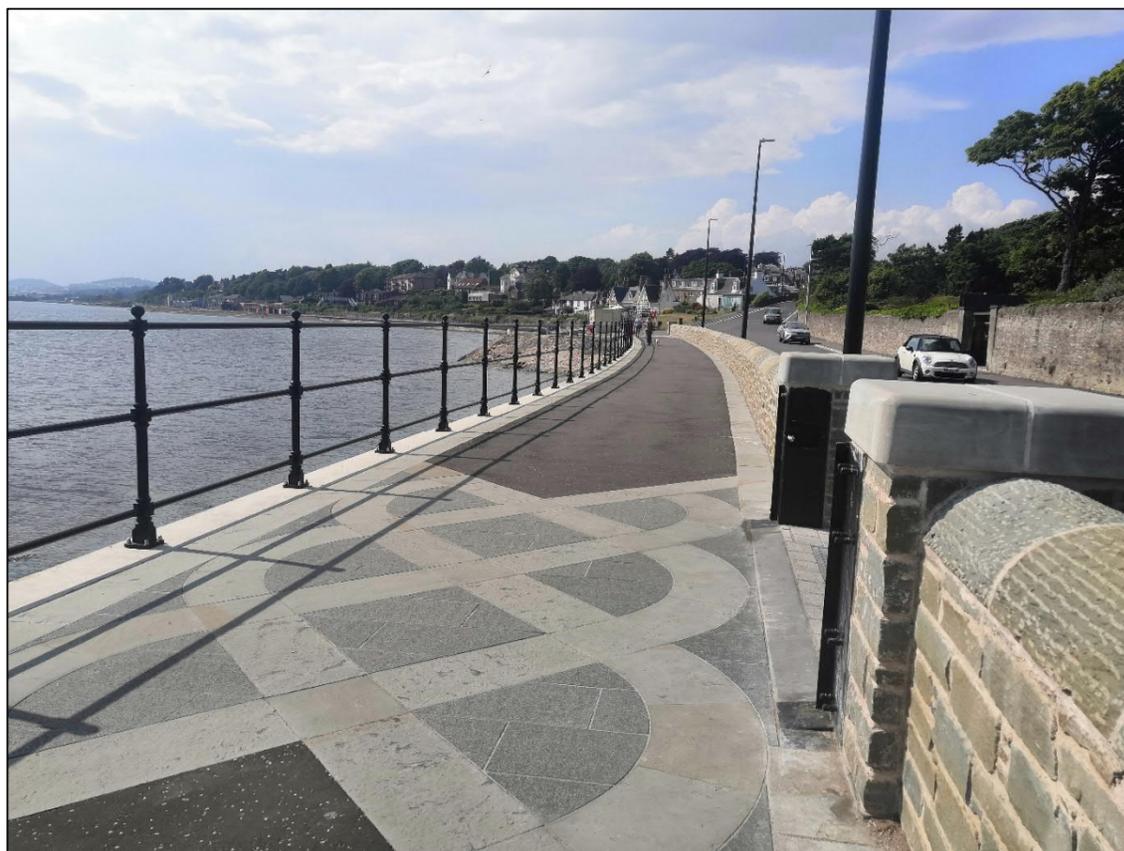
Active travel facility adjacent to new flood wall, Broughty Ferry
